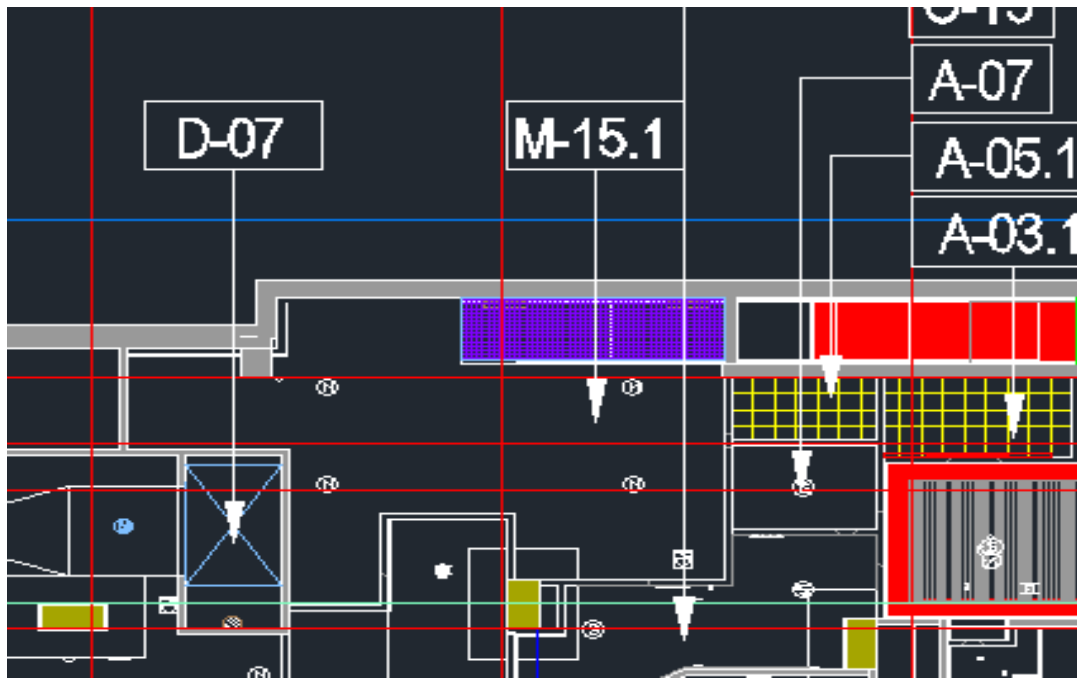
AutoCAD layout (Floor Plan) of Station AHU Room (M-15.1)
